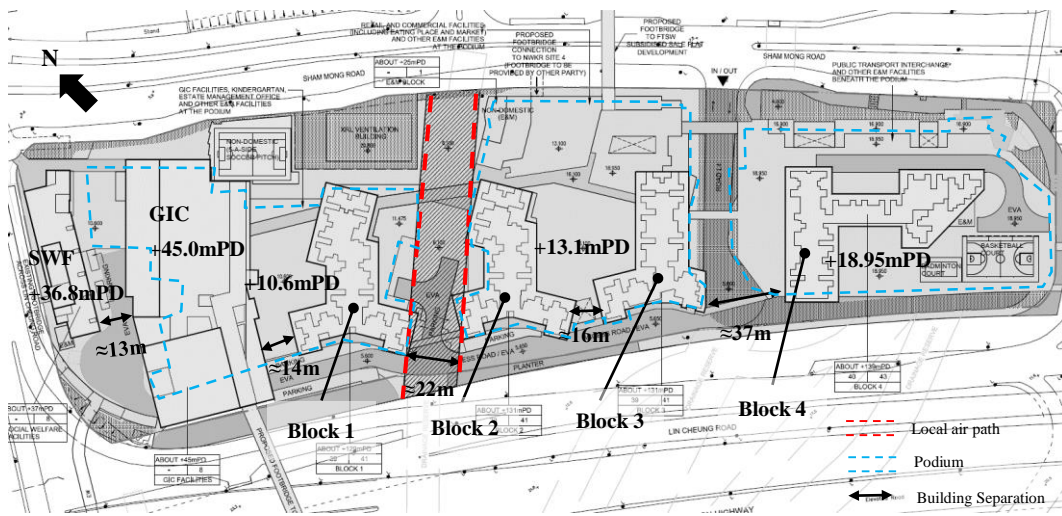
Master Layout plan of Proposed Scheme of NWKR Site 6
